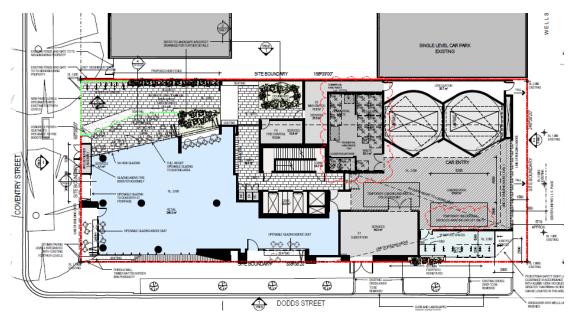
Endorsed Ground Level Plan (TP02.03)
